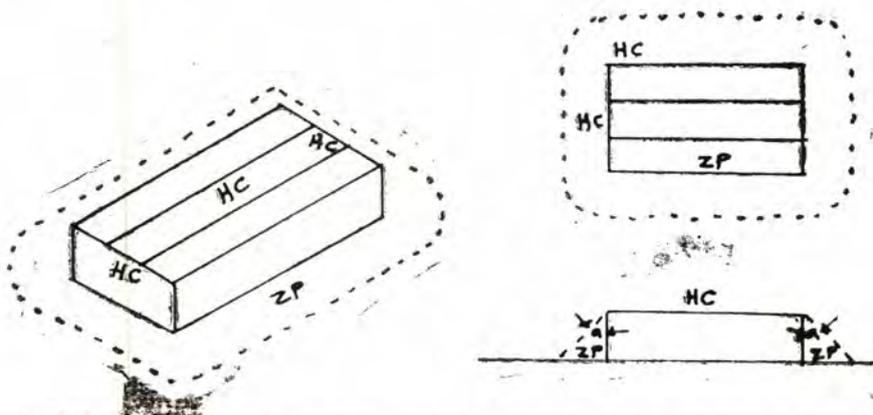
HORIZONTAL AIR TERMINATION NETWORK ON A STRUCTURE WITH LARGE AREA ROOF
